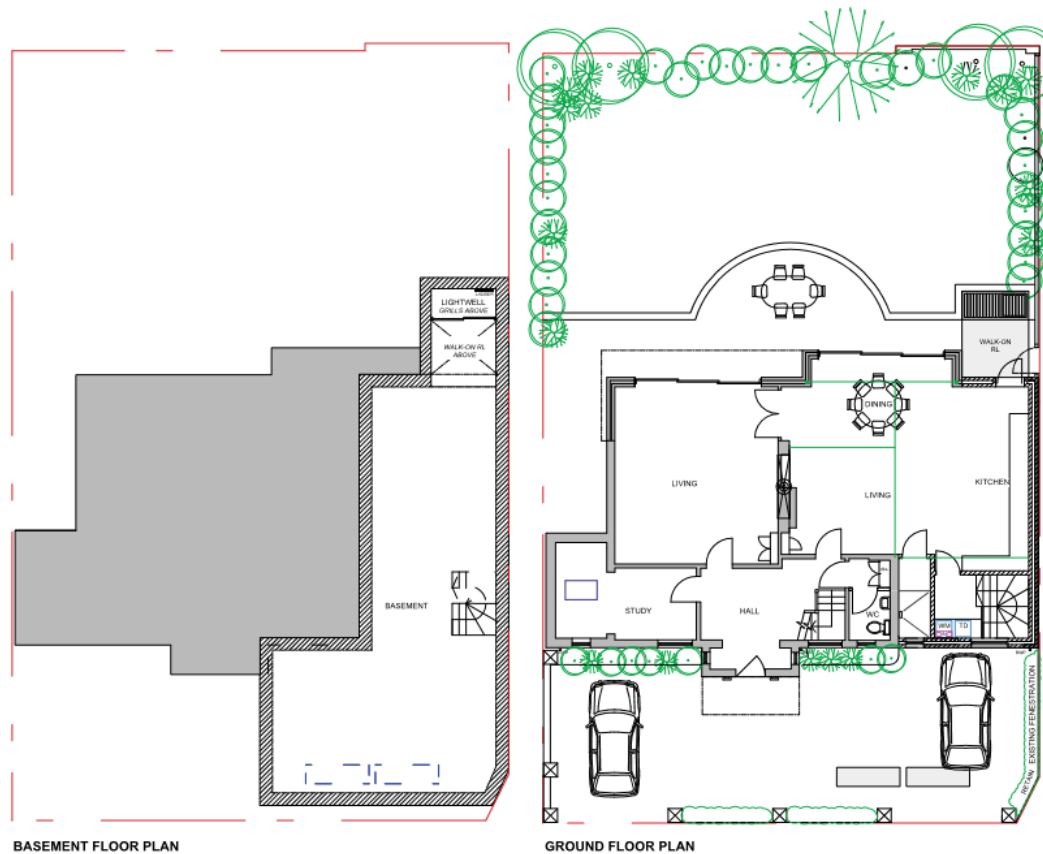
Proposed Site Layout - Plan View – Ground Floor & Basement
